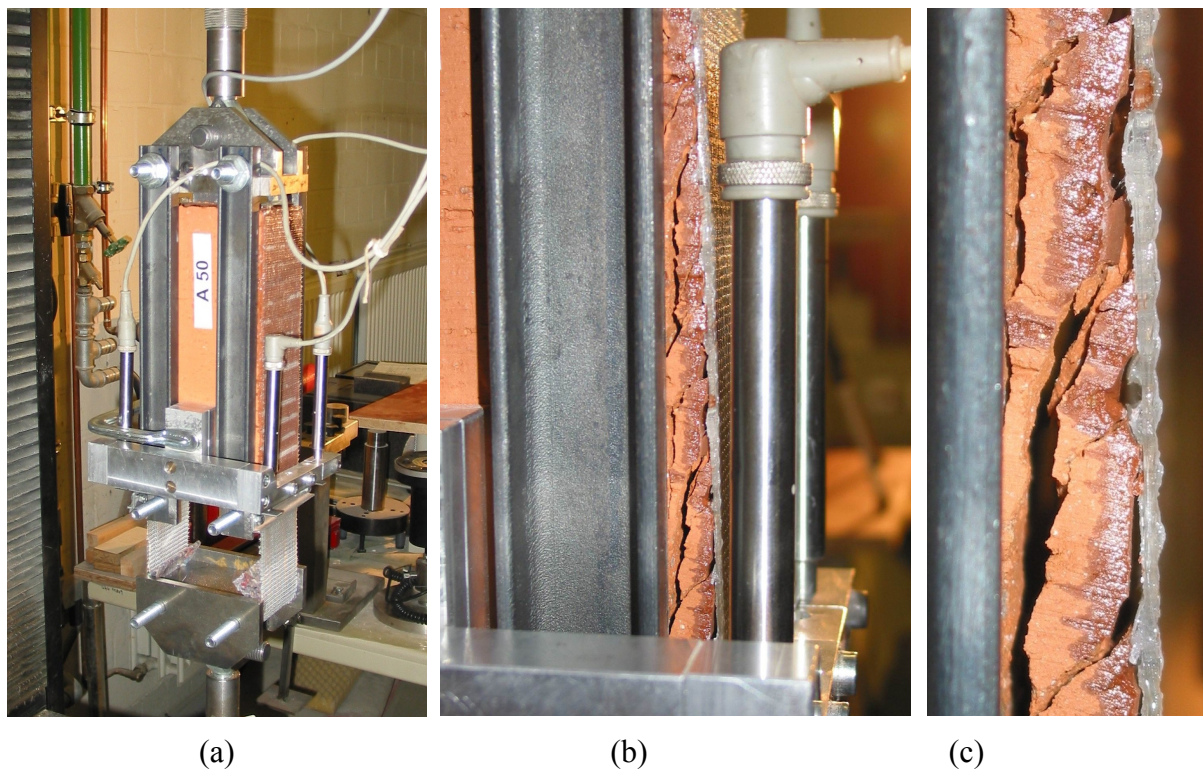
(a) test set-up of single masonry unit, (b) failure mode with tooth formation, (c) detail of “teeth” (Mz20-SP55-1L)
